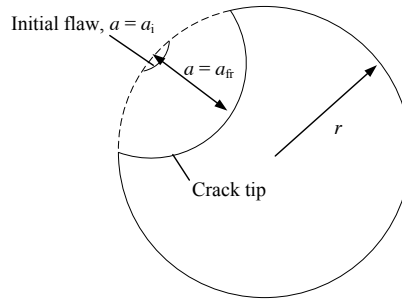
The cross section of rebar with initial flaw and crack propagation
